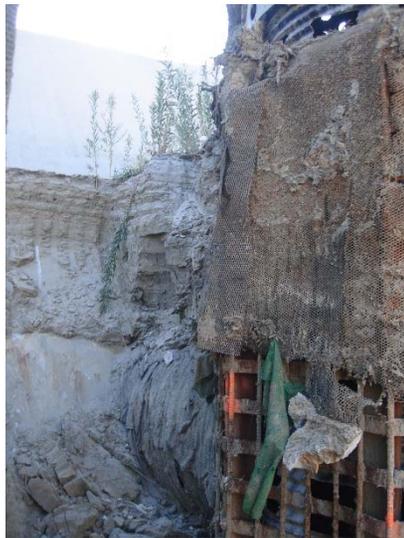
Terminal Basin Outlet Risers: September 26, 2017
